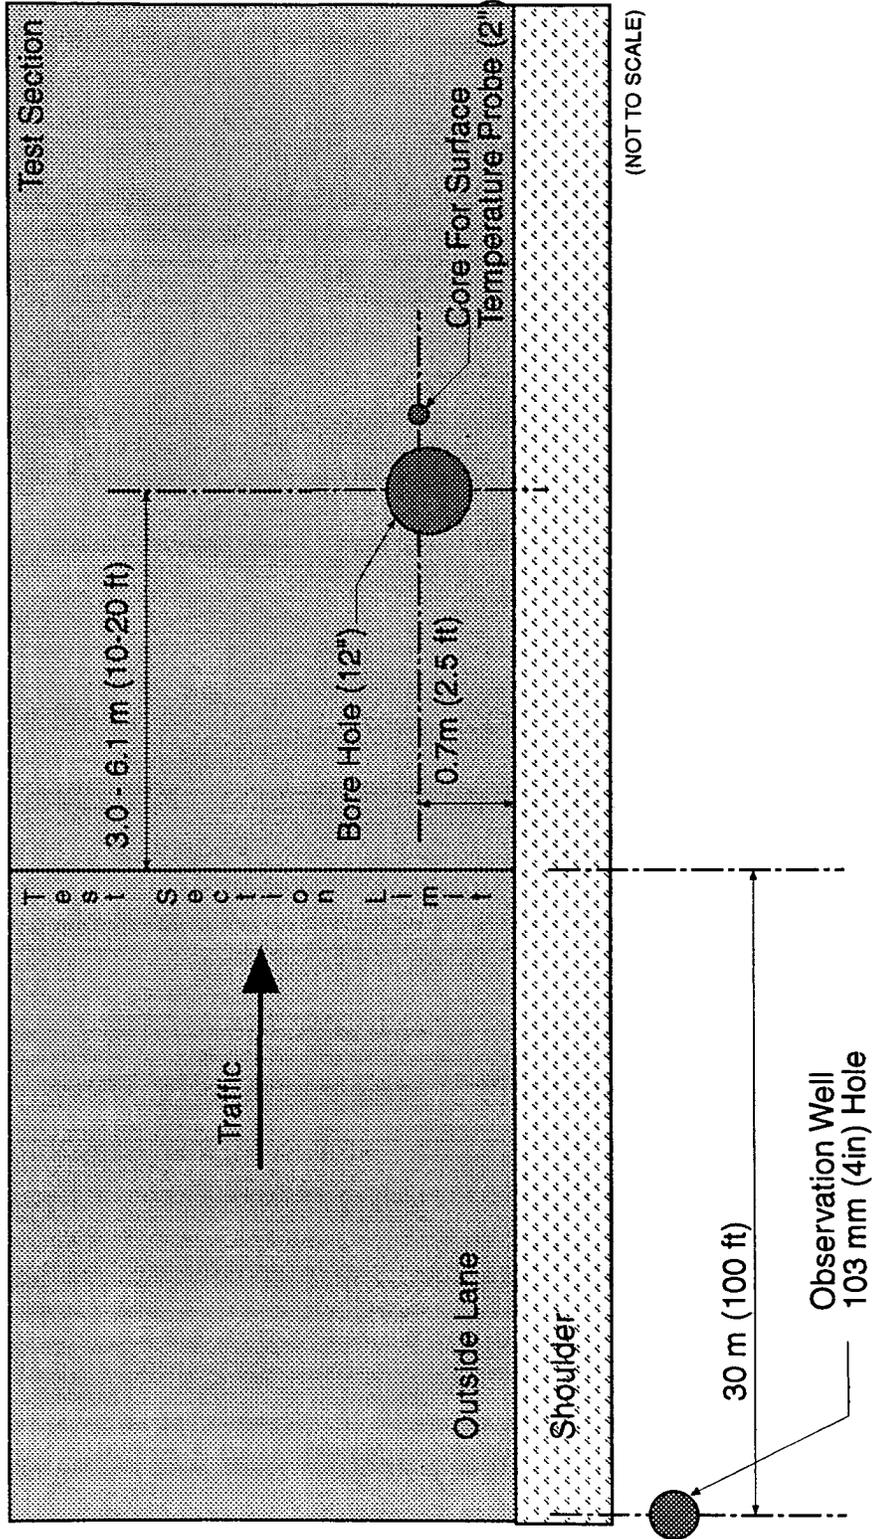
Typical Layout of Seasonal Instrumentation Hole for AC & PCC Sections.
